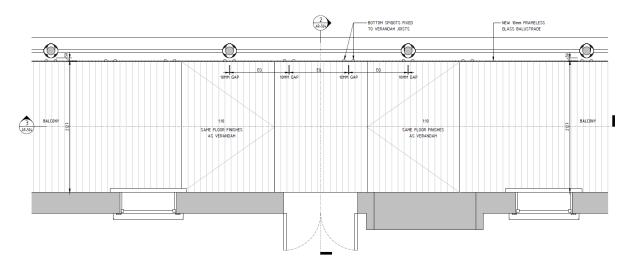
Chosen option for the northeast/east balcony ramp. The ramp will be extended to the width of the balcony and the proposed glass balustrade will also be used as the ramp balustrade. Source: CCG Architects, 2022.
